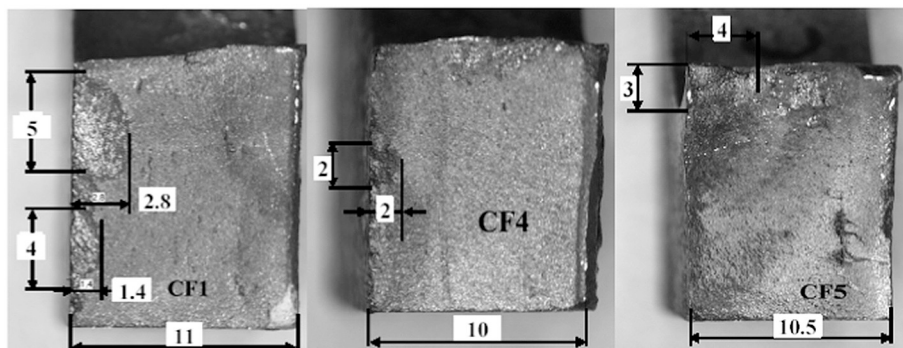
Initial crack-like flaws observed in some tested riveted specimens from the Pinhão bridge [32].
